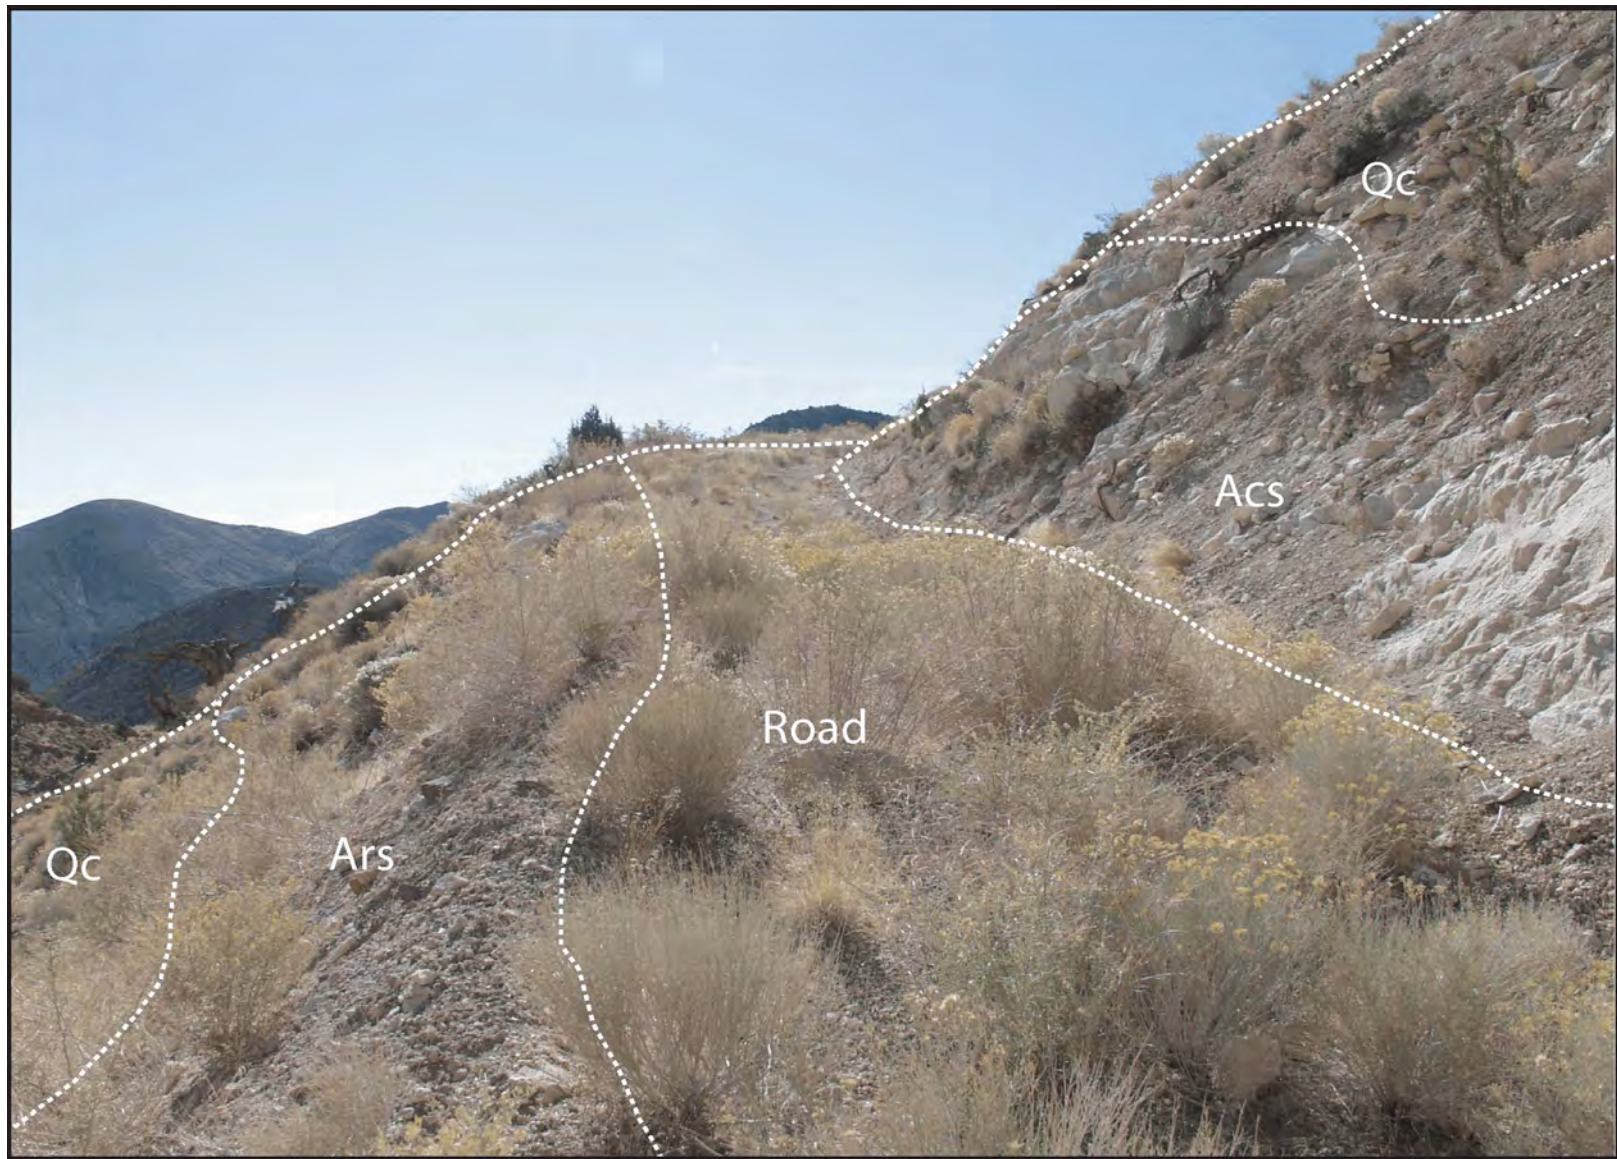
View south on road to upper pad above U12n Tunnel portal area showing cut slopes (Acs) in bedrock and colluvium and road side-cast (Ars) along the access road.
